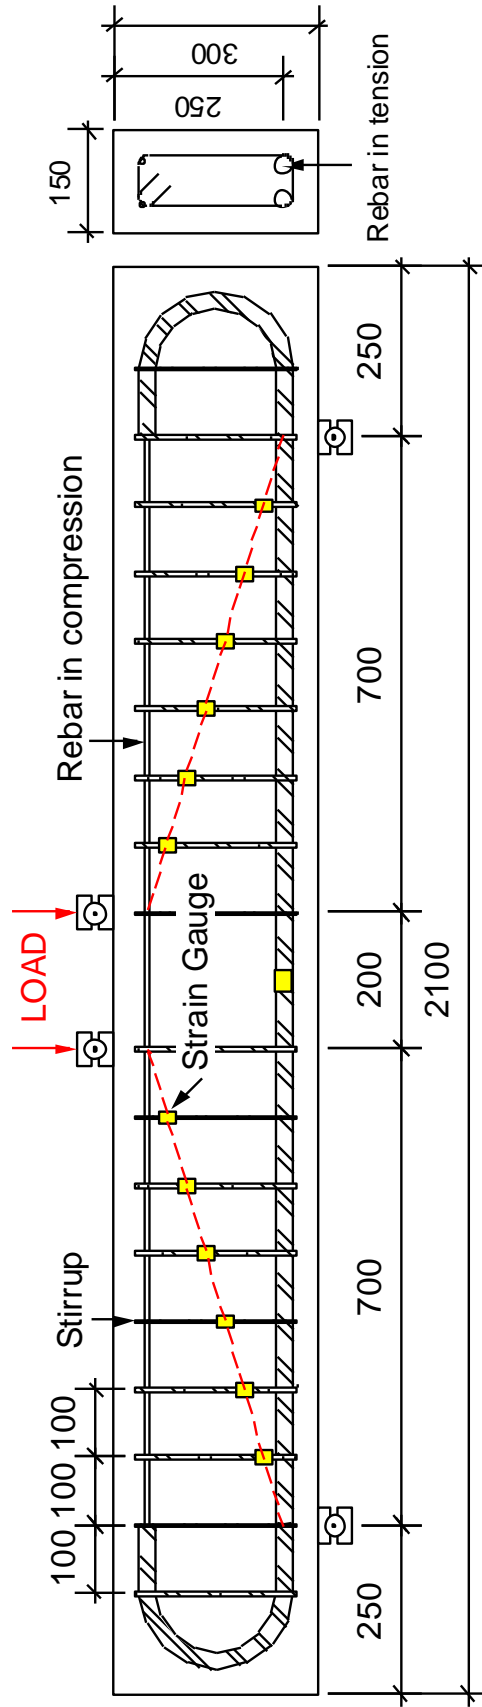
Dimensions and reinforcement details of RC-Ref. or RE-42.
